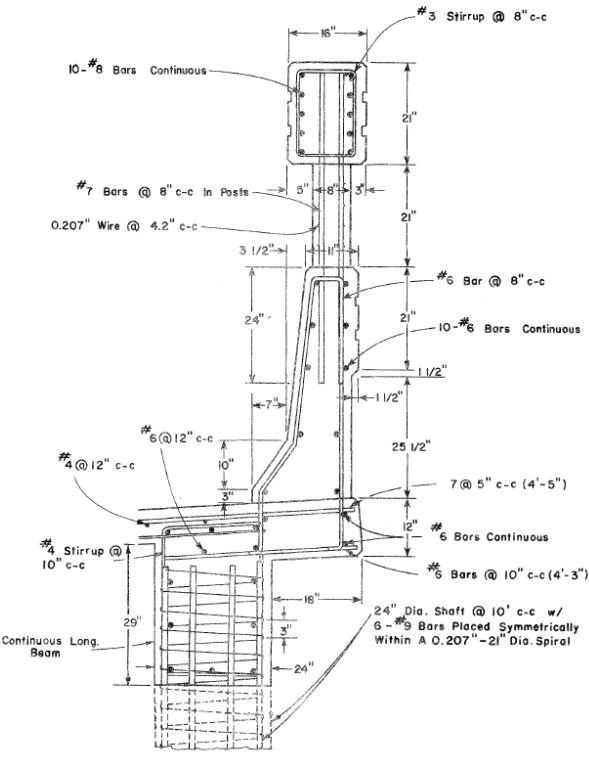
Cross Section of the Modified T5 Bridge Rail and Modified Bridge Deck.
